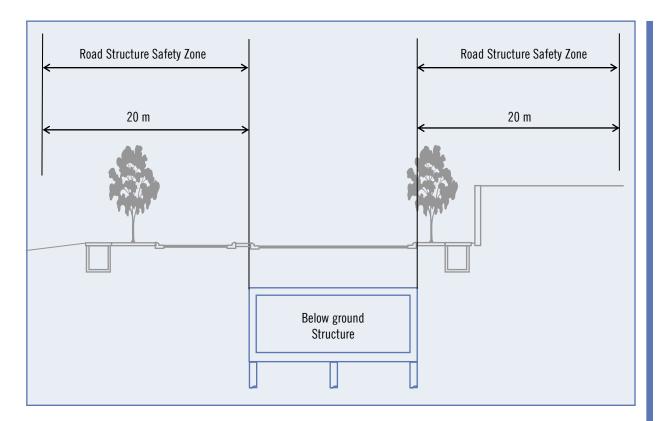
Road Structure Safety Zone for Structures Below Ground Structures
